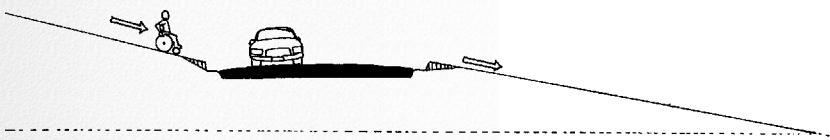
POTENTIAL PROBLEM: When the curb ramp section of the sidewalk corridor is not level, curb ramp grades are significantly increased and users cannot quickly move out of the street.
